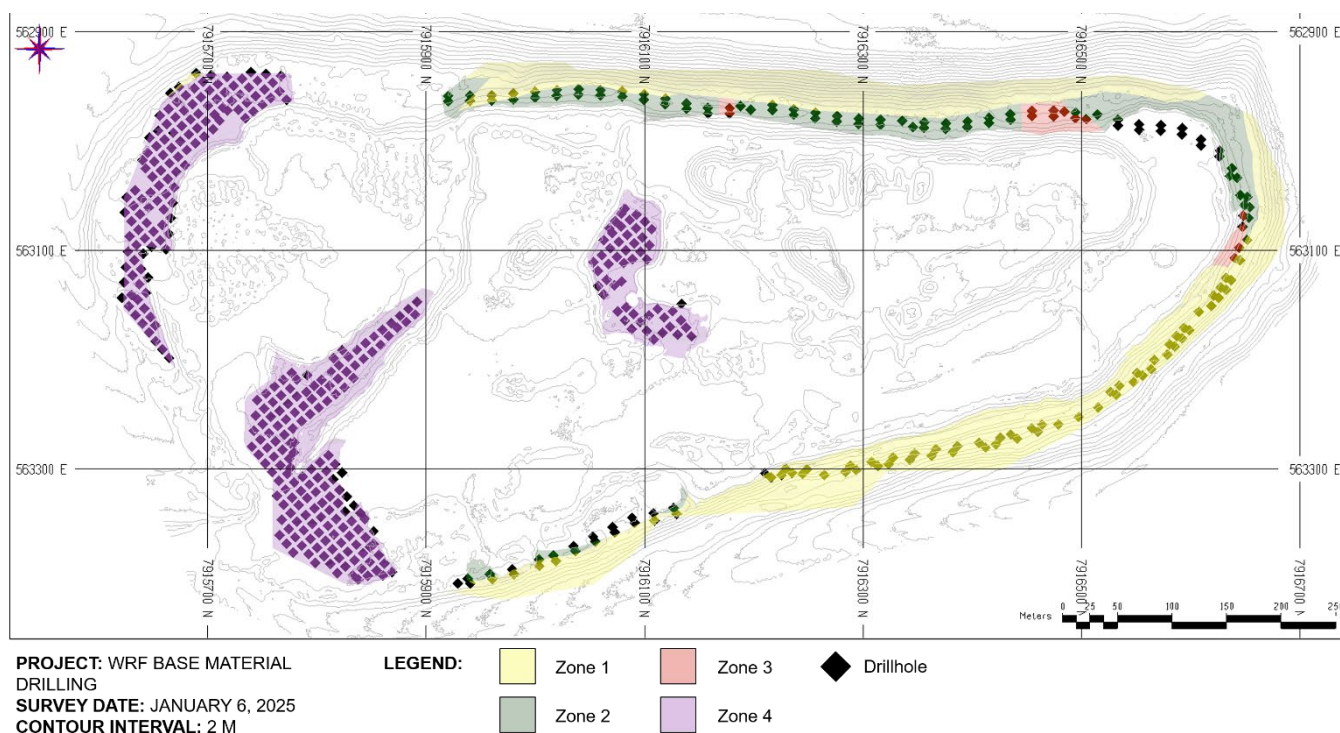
Locations of Waste Rock Facility Base Material Drilling Zones 1 to 4
